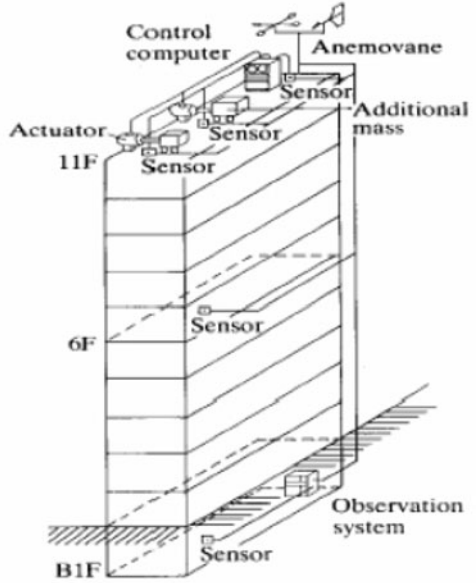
Kyobashi Seiwa Building, Tokyo Japan (ATMD)
